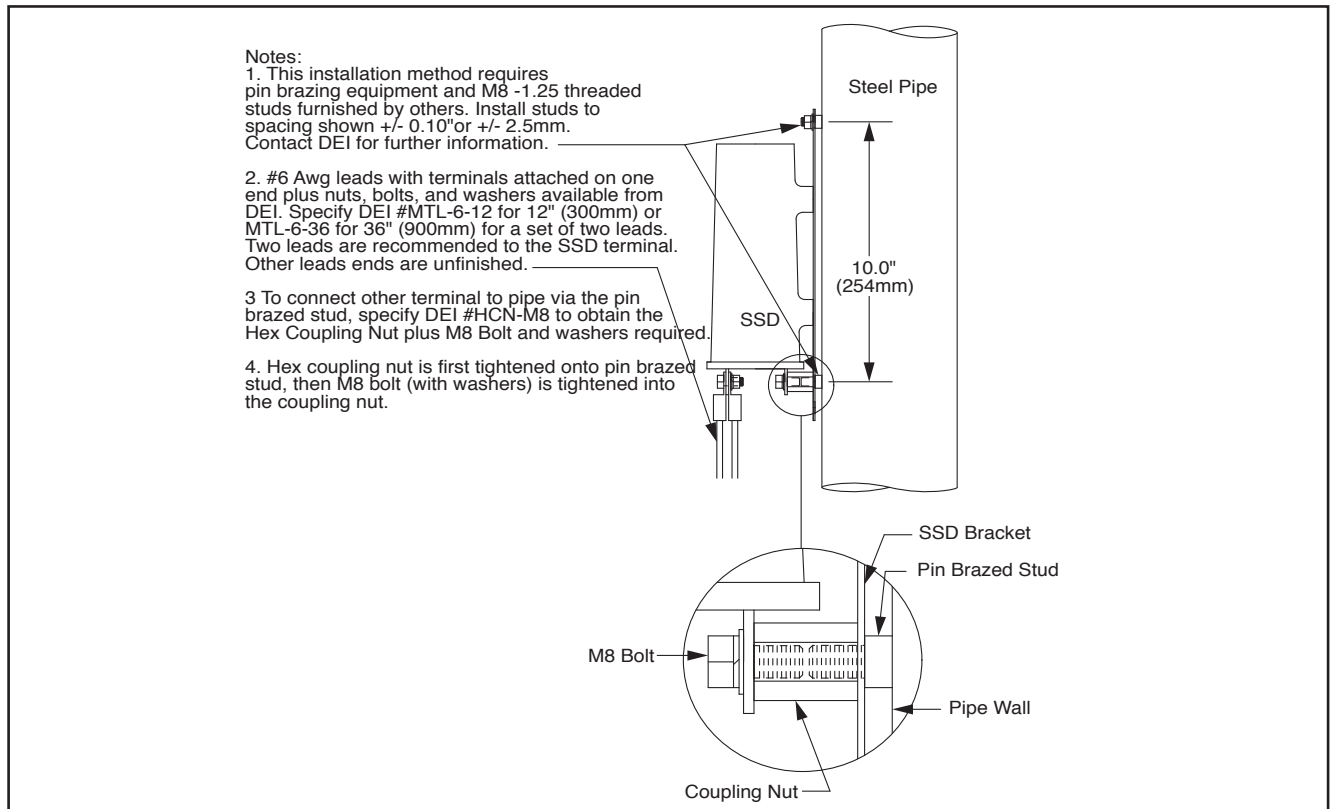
Flange Mount Using Tapped Holes or Pin Brazed Studs
